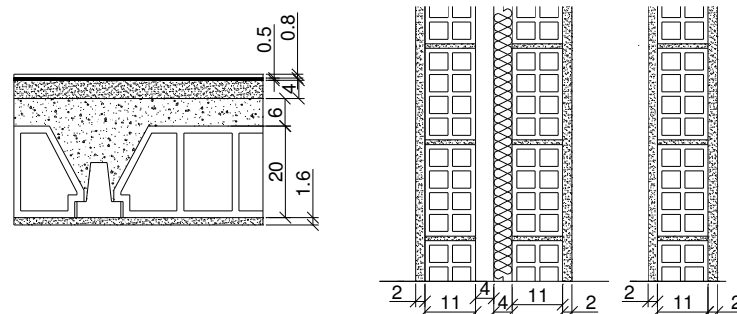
Vertical cross-section of the construction solution of the building floor and walls (internal and partition).
